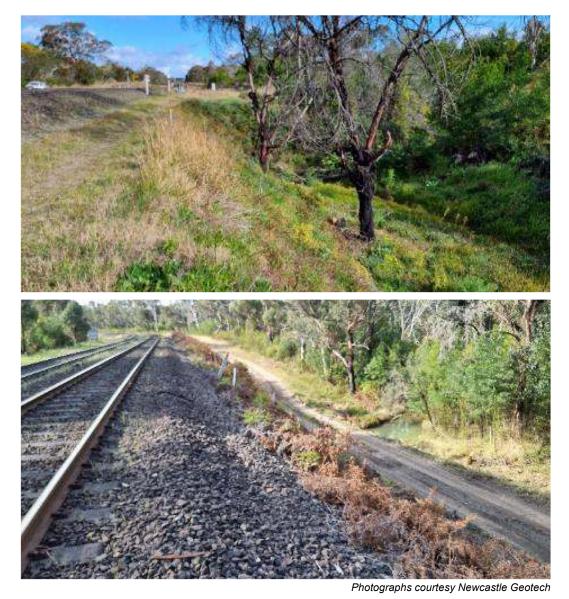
Embankment at 100.121 km on Up side and Down side
